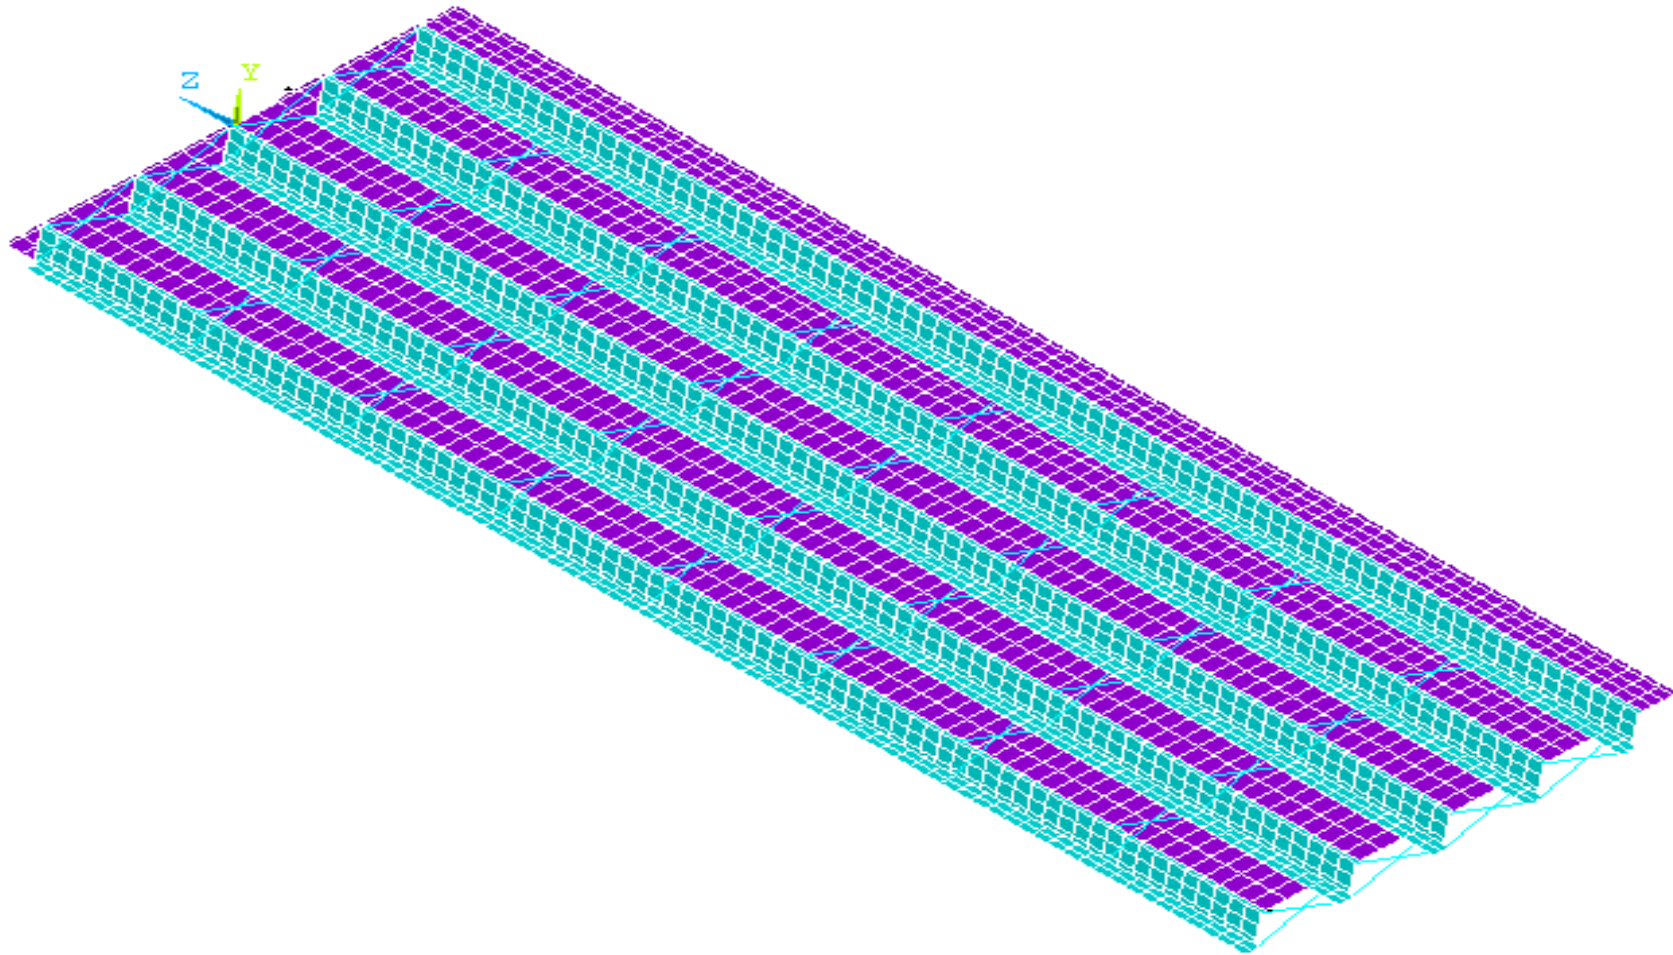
Finite element model for 40 m span with 5 girders at 3.375 m spacing
